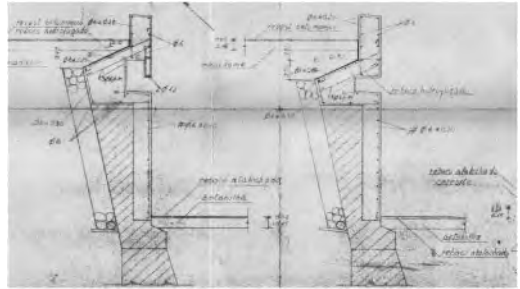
Ocean swimming pool, B. Ferrão, retaining walls, 1970 (Arquivo Câmara Municipal de Matosinhos).
